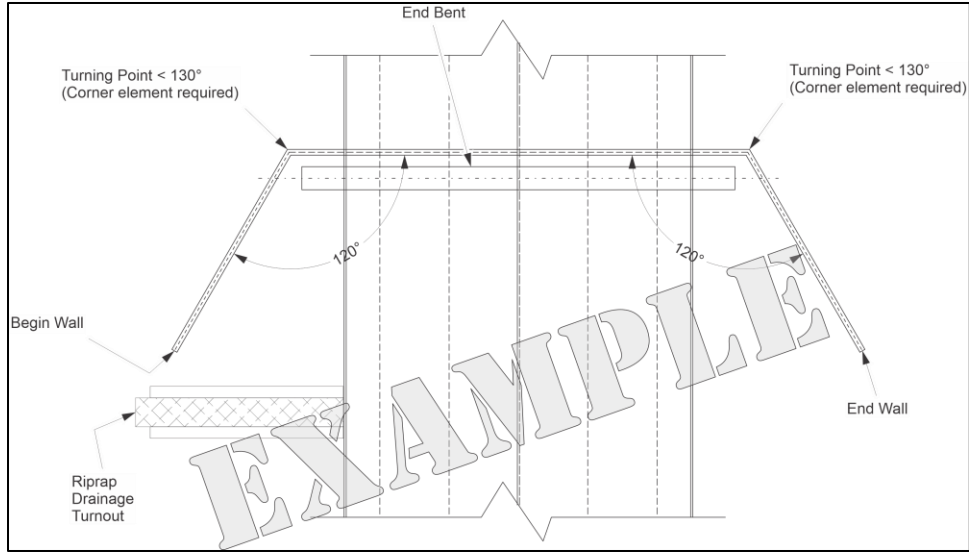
Example plan view of bridge end bent with MSE wall requiring corner elements
